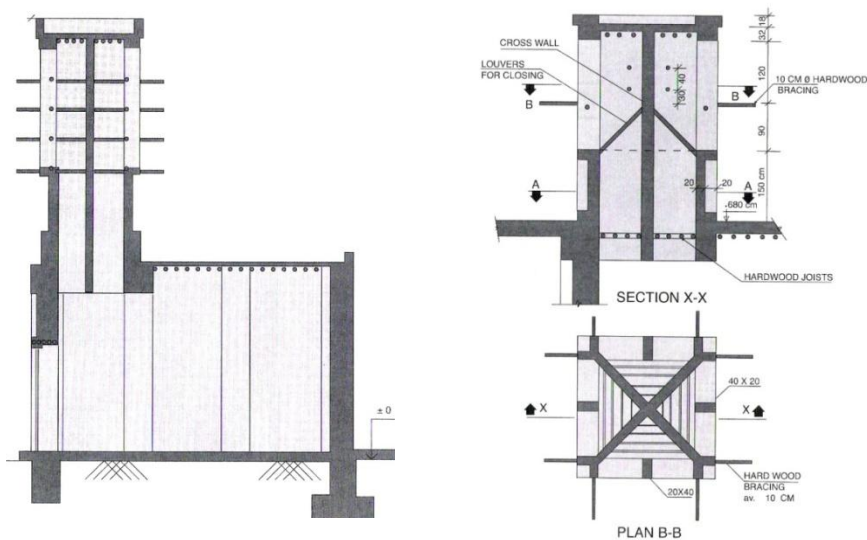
Figure C: Detailed sections of wind-tower structures. (All drawings in this page are from Elements of Traditional Architecture in Dubai, 2000)
